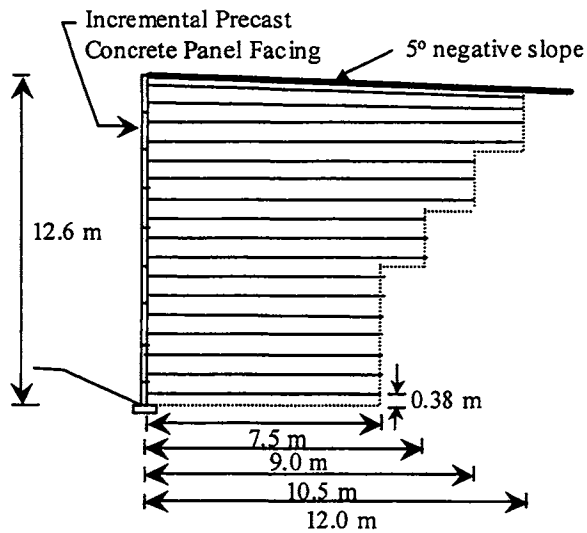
Ngauranga, New Zealand, steel strip MSE wall (adapted from Boyd, 1993).
